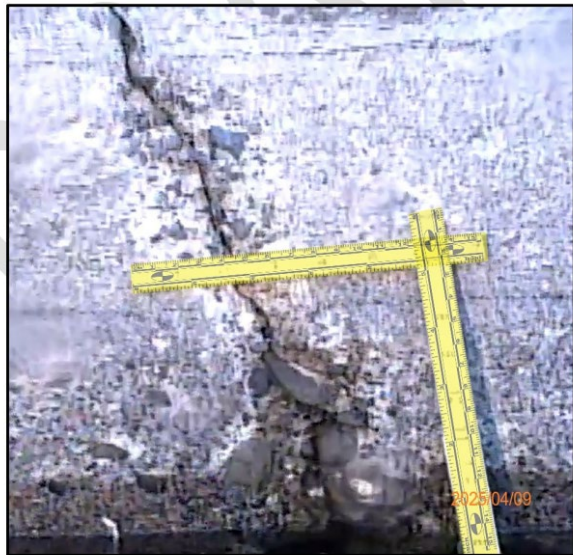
South Pier, West Face, 1/8-in wide Crack with Spalling
